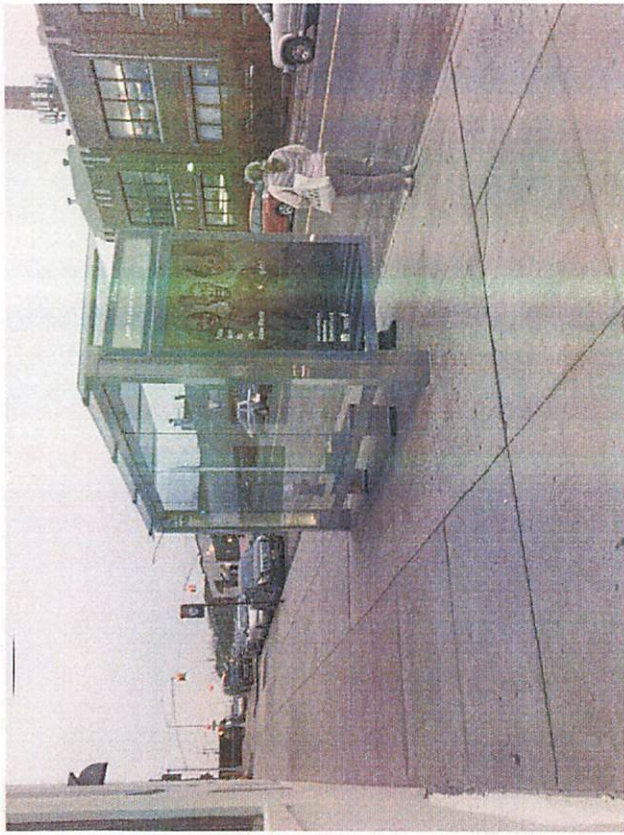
View of the facility and bus stop, looking east from 48th Avenue
